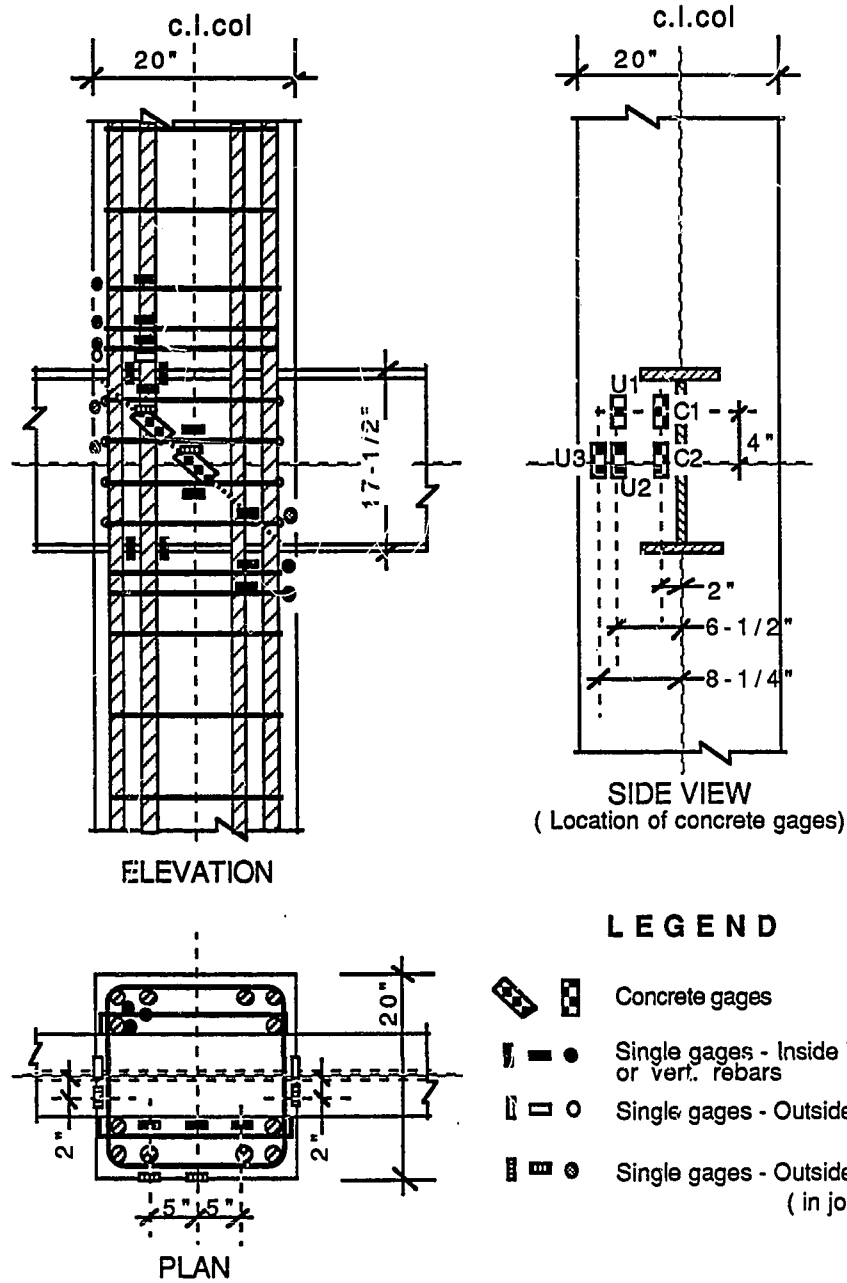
Instrumentation on reinforcing bars and concrete -- specimens 3 thru 9.
